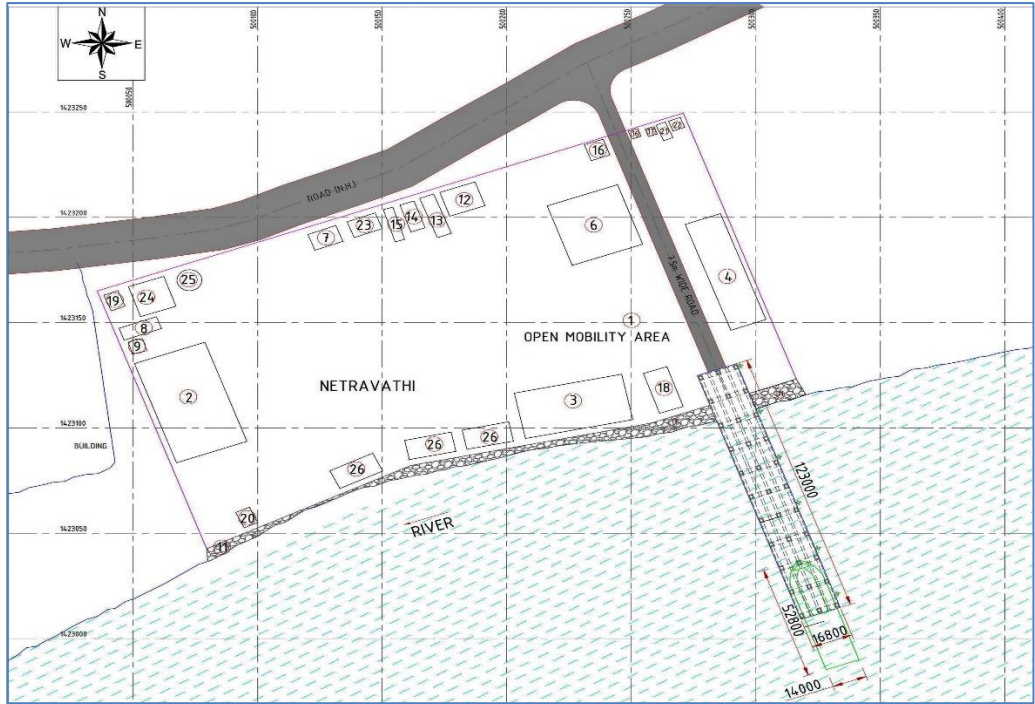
Site Layout plan of proposed Ro-Ro terminal (B) at downstream of Thumbe Barrage (Netravati River)
